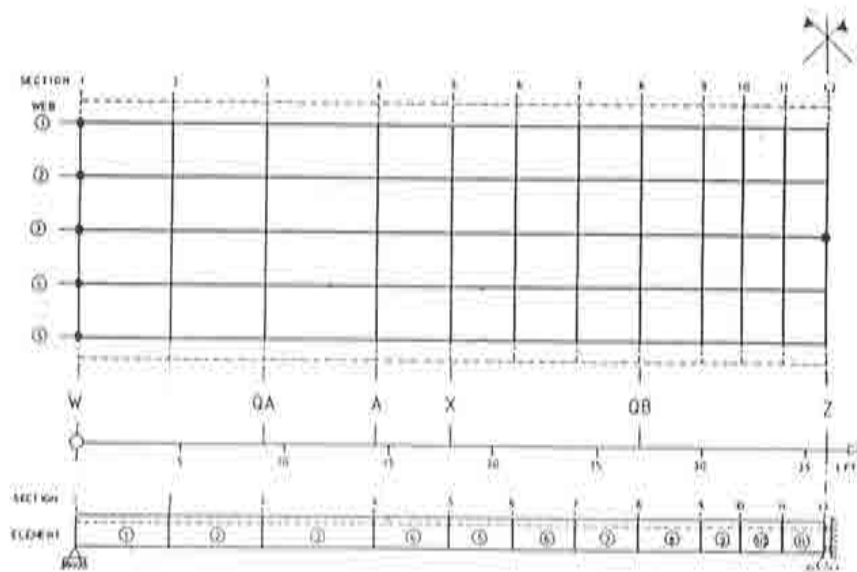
Geometric properties of multi-cell concrete box girder bridge model (from Ref. 41)
